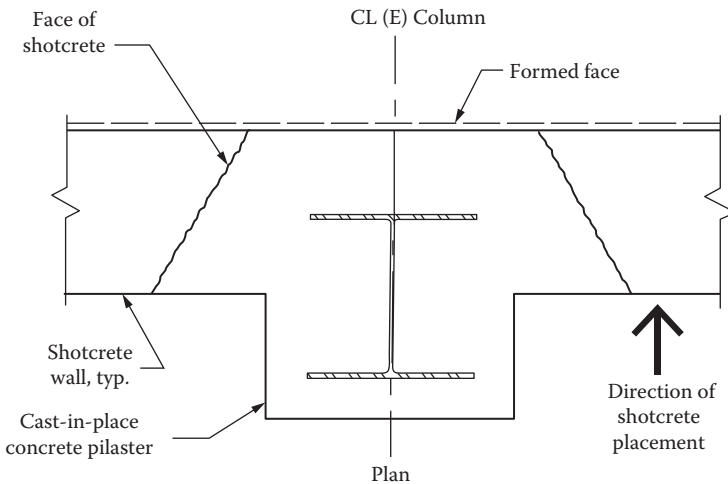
Combined shotcrete and cast-in-place construction. *Notes:* 1. Wall reinforcing steel not shown for clarity. 2. Shotcrete shadowing restrictions at steel column prevents use of shotcrete for pilaster.
